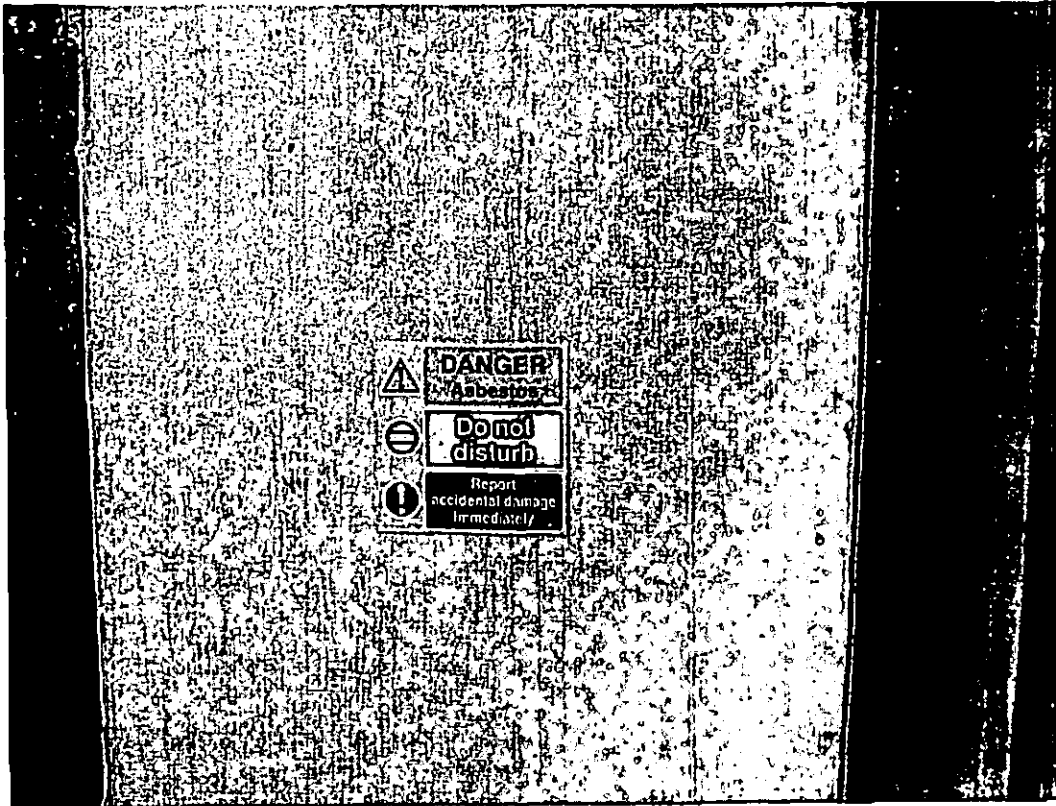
Ref: 01/5 . Boards to doors containing Amosite.
